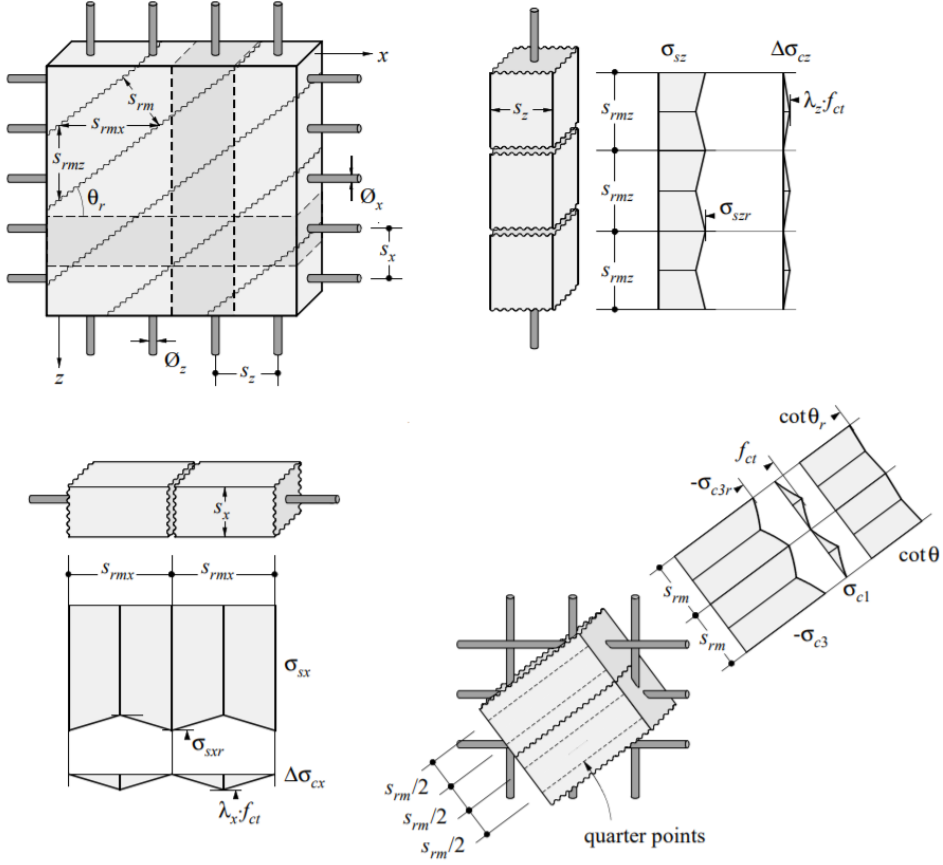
Crack spacings and concrete stresses (Kaufmann 1998)
